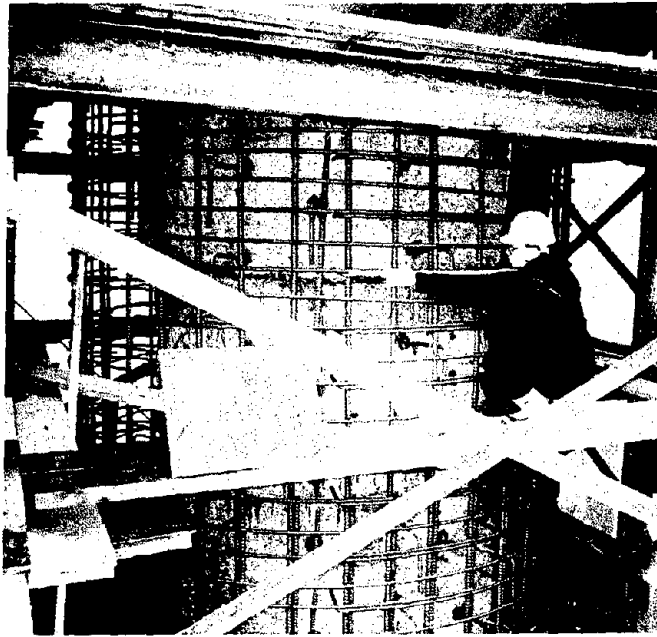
Repairing of 2 Pier at Matsunoe Bridge
